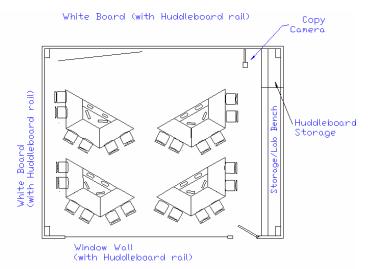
Floor plan for new classroom consisting of work clusters for six students each.
